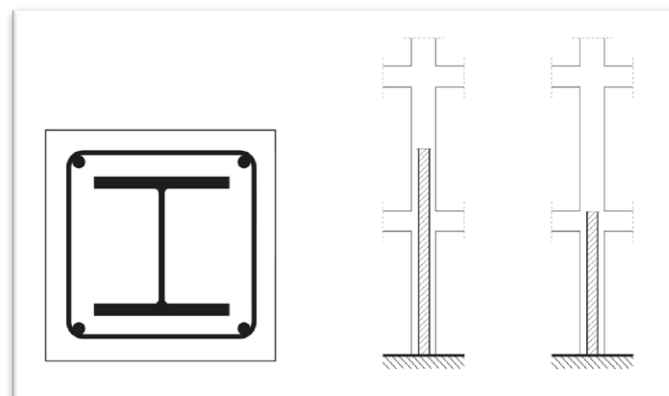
Left: Section of steel-concrete composite column, Right: Implementation in the ground floor, or up to half way the second floor of H-beam in concrete column (Arcelor Mittal).
